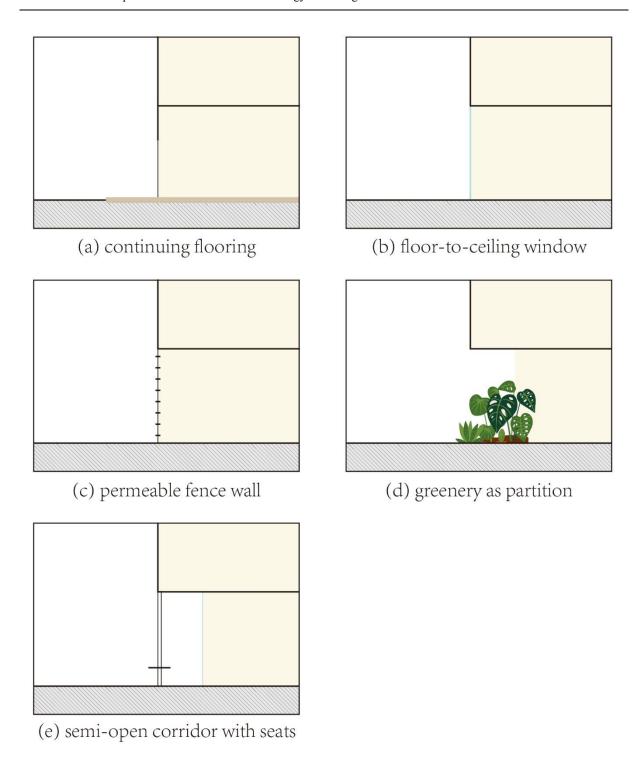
Typology of Interface between New Building and Open Space (Source: by author)
